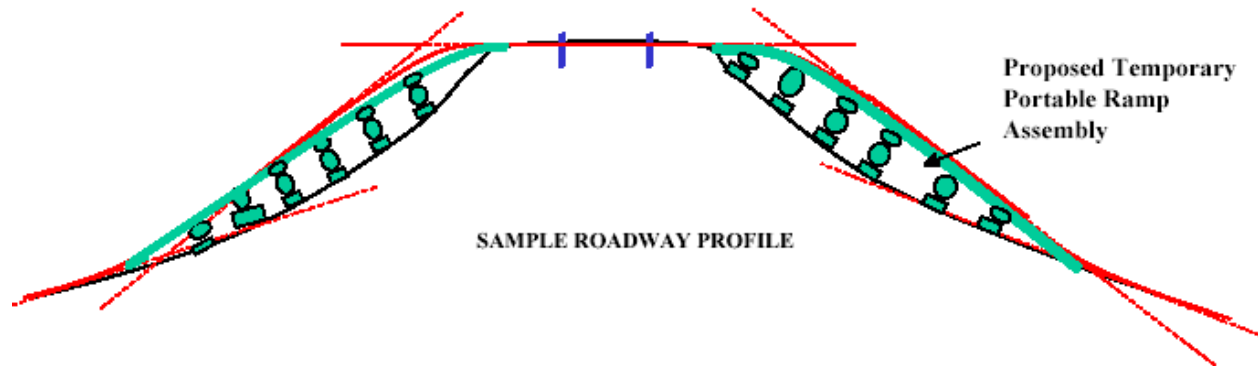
Use of Portable Temporary Ramp at Railroad Crossings (Roadway Profile).
